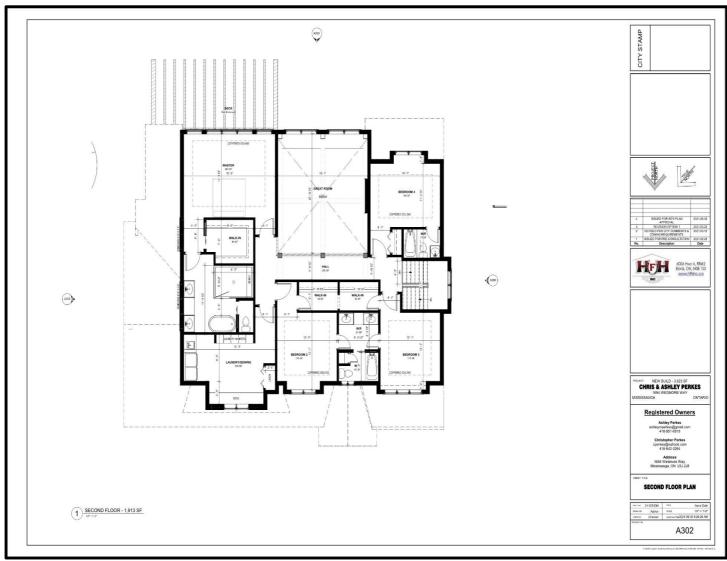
Proposed Development – Second Floor Plan (H4H Inc. 2021)
